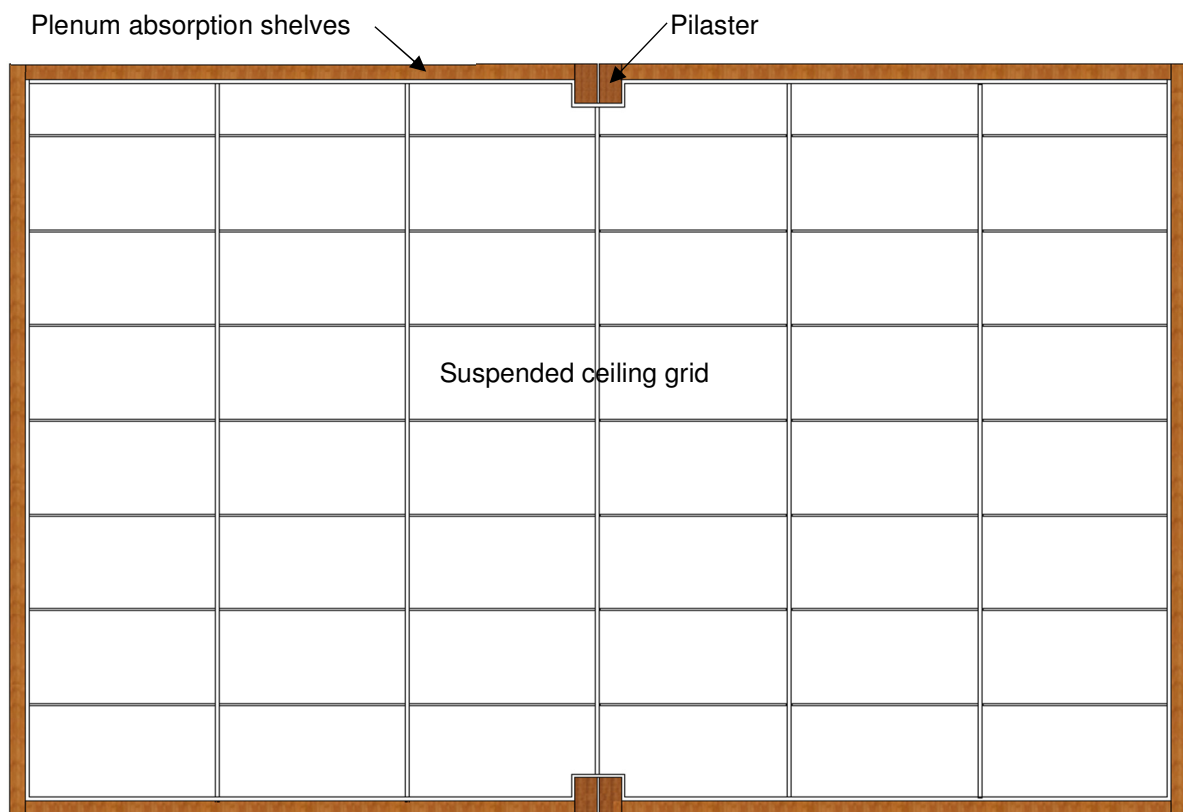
Layout of the suspended ceiling, pilasters, and edge shelves in the CFN facility at the University of Canterbury
